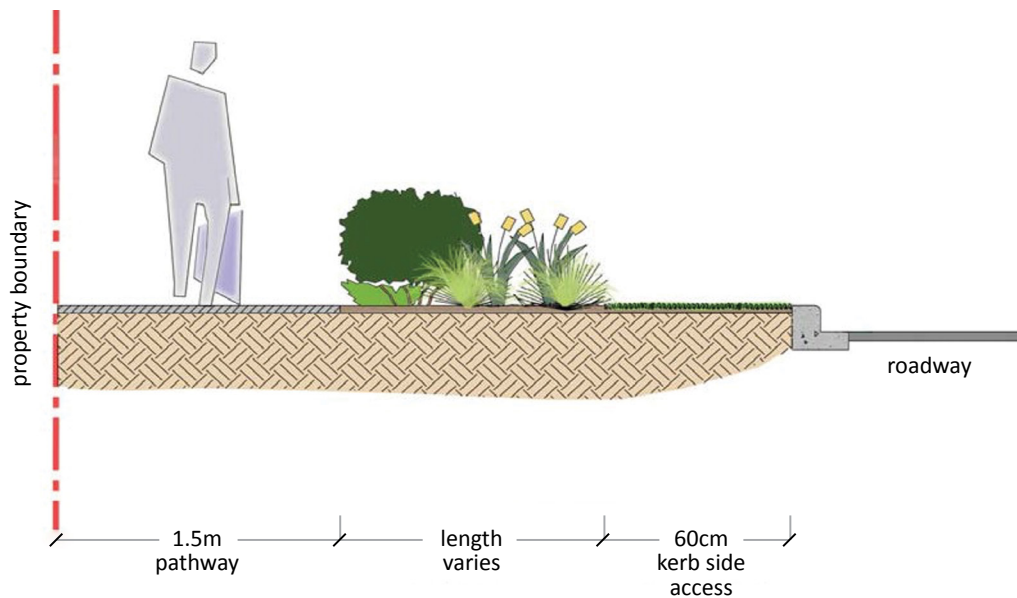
A 60cm access area must be maintained between the kerb and in ground planting.
